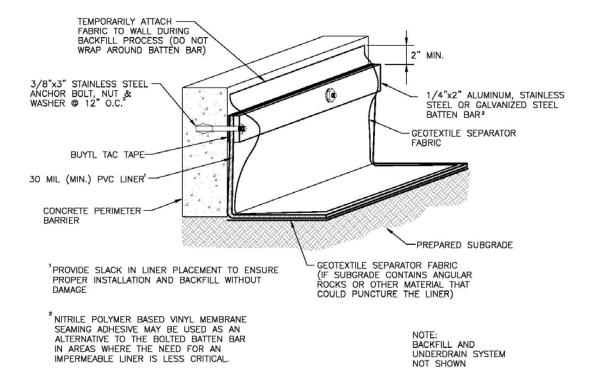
Geomembrane Liner/Concrete Connection Detail
